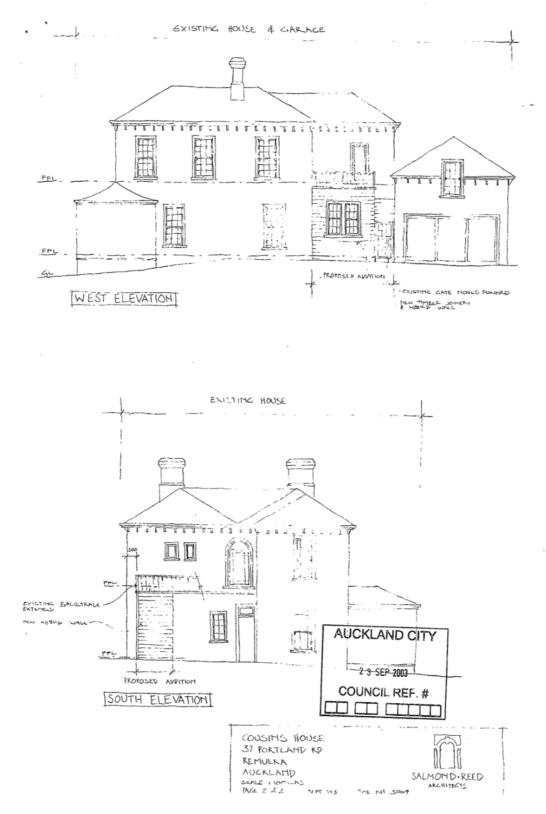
Proposed drawings showing the small addition to the rear (south) elevation and extension of the associated first floor deck and balustrading (R/LUC/2003/5704749 – Land Use Consent Plan, Auckland Council property file: 37 Portland Road).
